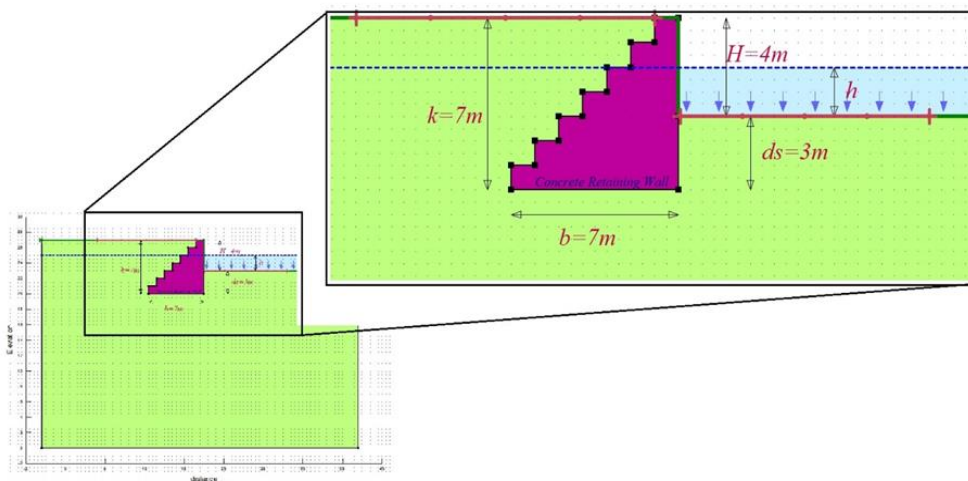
Transverse profile of concrete retaining wall in mirror condition
